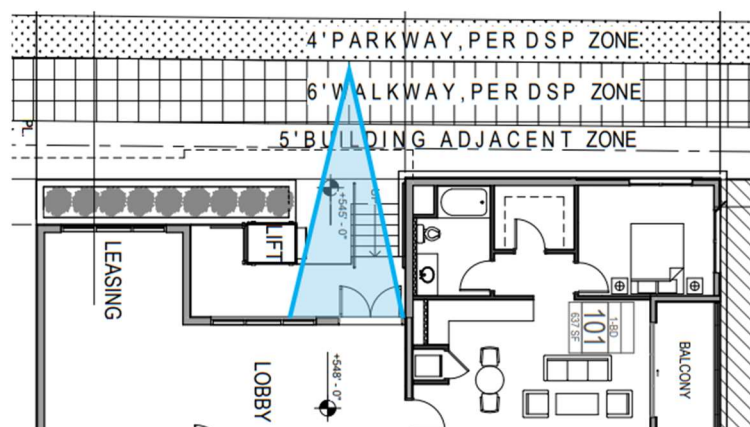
Annotated, excerpted first floor plan, sheet A-3.1. The added blue cone is the area of the main entrance that is expected to be visible to pedestrians and may be a mere 13 feet wide. As shown, the visible area in the building leasing office would be limited to double doors and part of a single, storefront window and would be very limited. North in this case would be the to the right.
